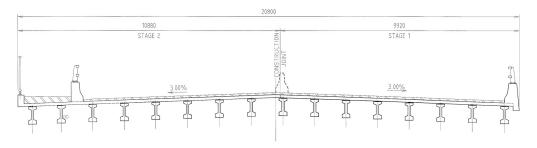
Cross-section of the Shepherd's Gully Bridge [VSL, 2008]
